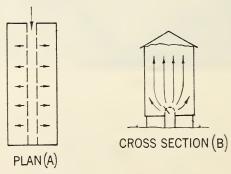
Use of shelling trench for air duct. Plan (A) and cross section (B) shown. All four walls of the crib should be covered as shown by solid lines and shelling trench should be airtight at end opposite air intake. Air blown into the shelling trench moves upward to the surface of the corn. A ventilator above the shelling trench should be added as shown if an air duct larger than the shelling trench is needed.
